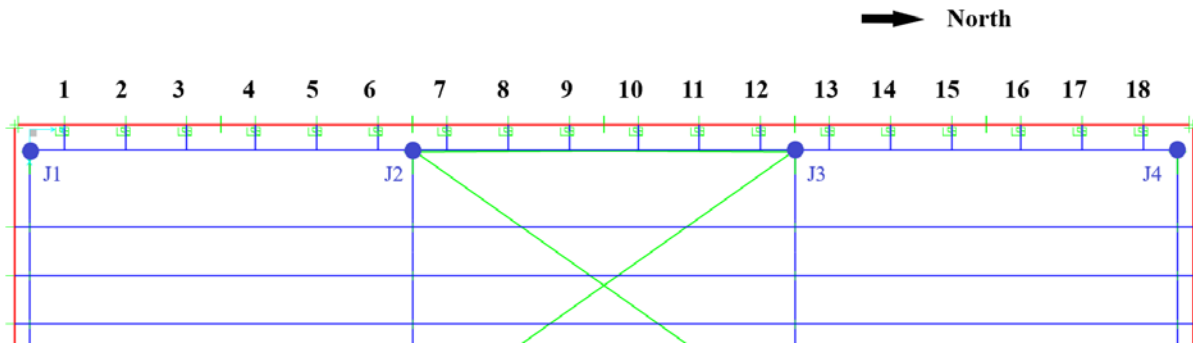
Joint and RFC Identification along West Wall for Models 16 and 85 (Plan View)
